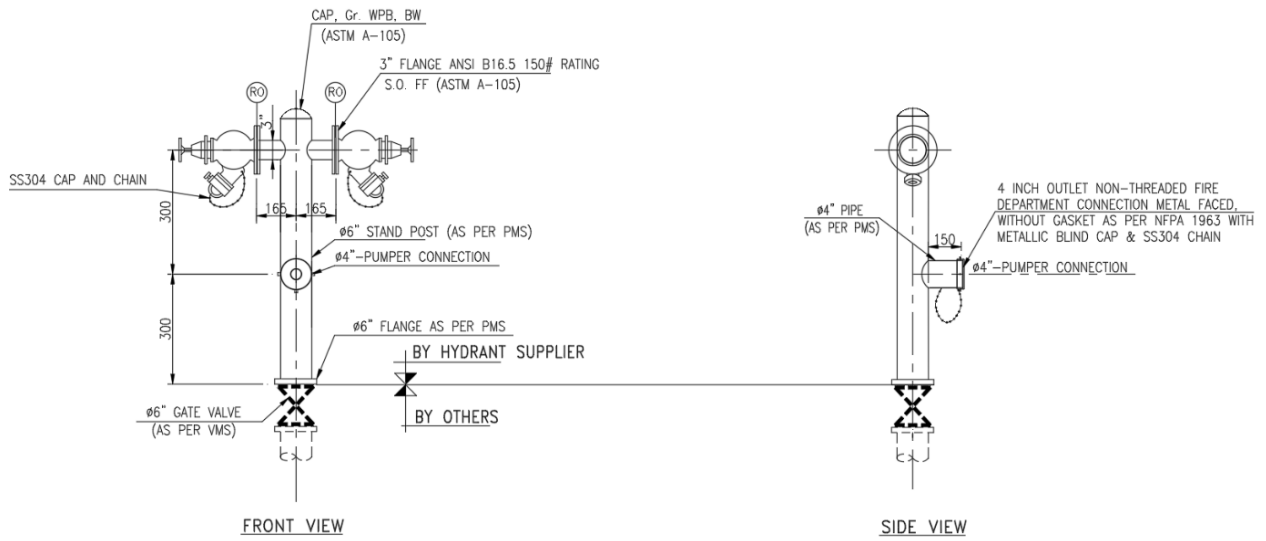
WAY HYDRANT WITH PUMPER CONNECTION
